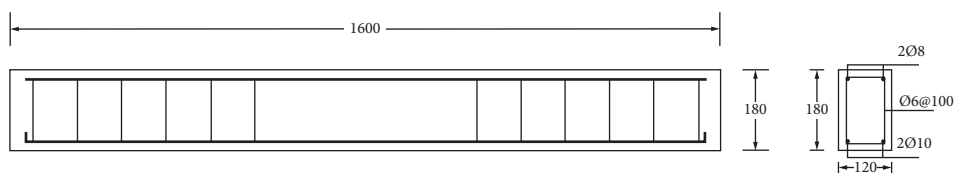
Size and reinforcement diagram of the test beam (unit: mm).
